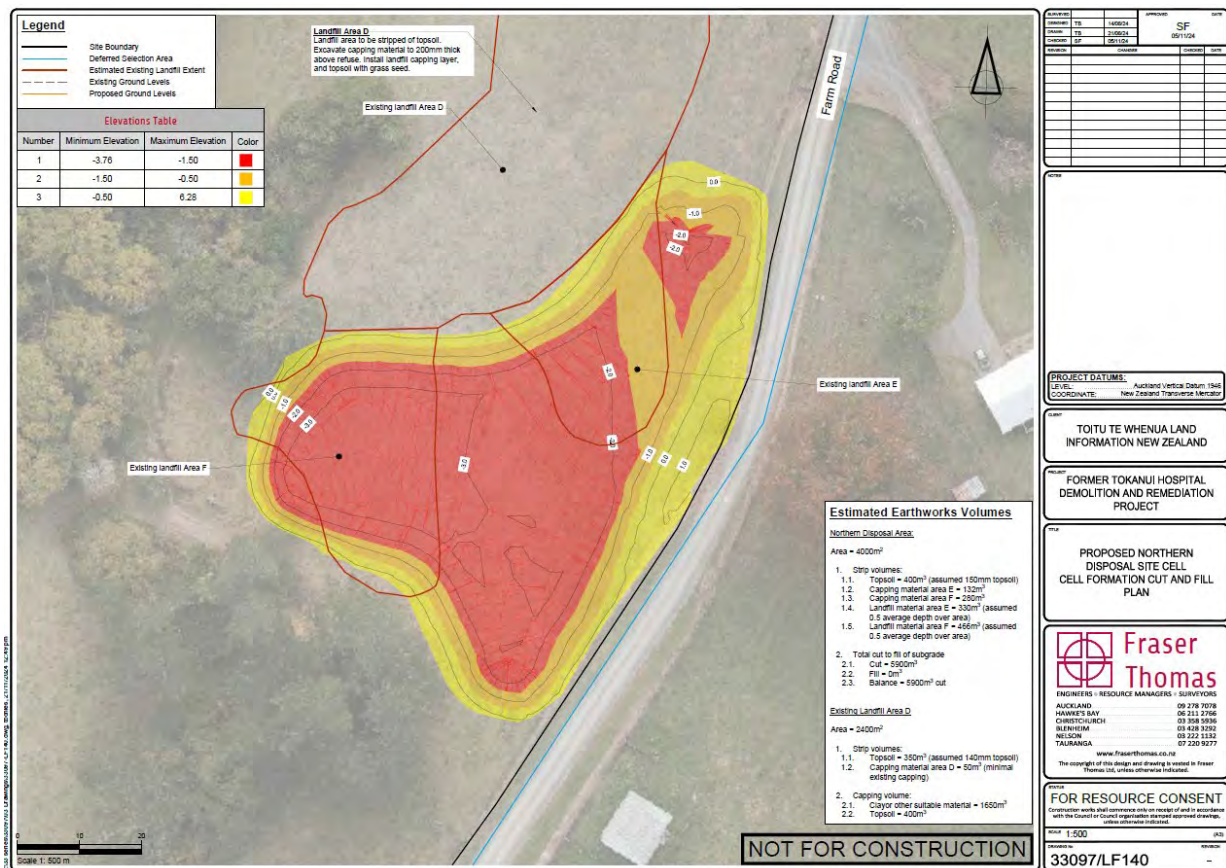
Proposed Northern Disposal Site Cell – Cell Formation Cut and Fill Plan
